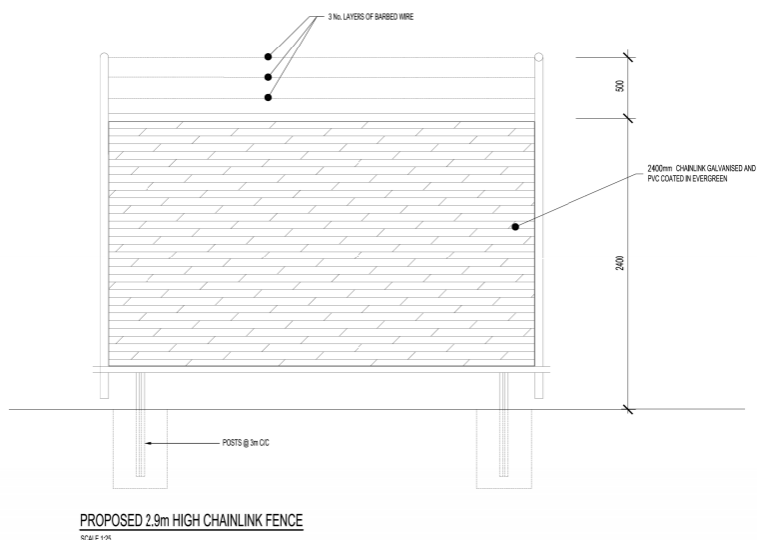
Proposed 2.9 m Outer Perimeter Fence
